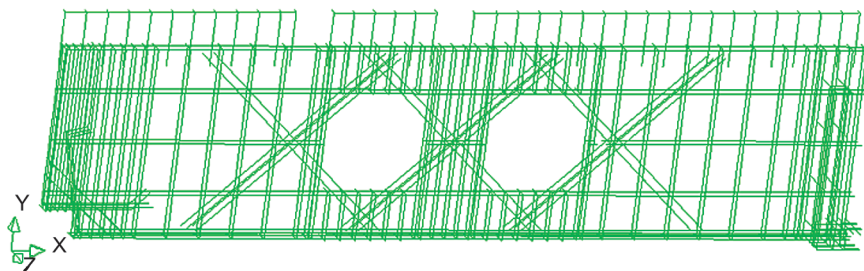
Arrangement of strengthening elements at reinforced concrete beam 15 m long
